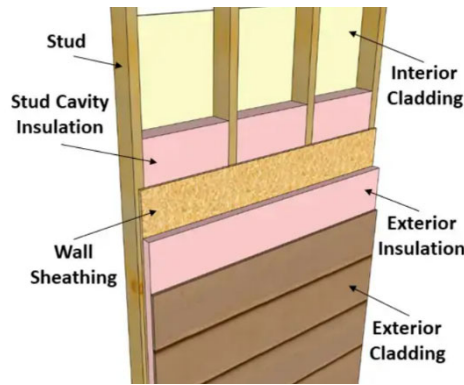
RS means, industry-standard exterior wood frame wall assembly (Builder's C., 2023)
